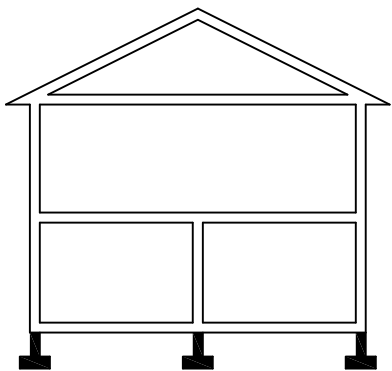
ROOF, CEILING AND TWO CENTER-BEARING FLOORS
